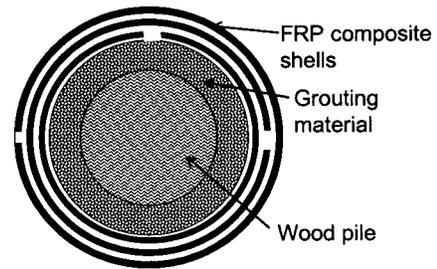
Cross section of wood pile repaired with fiber-reinforced polymer composite shells
